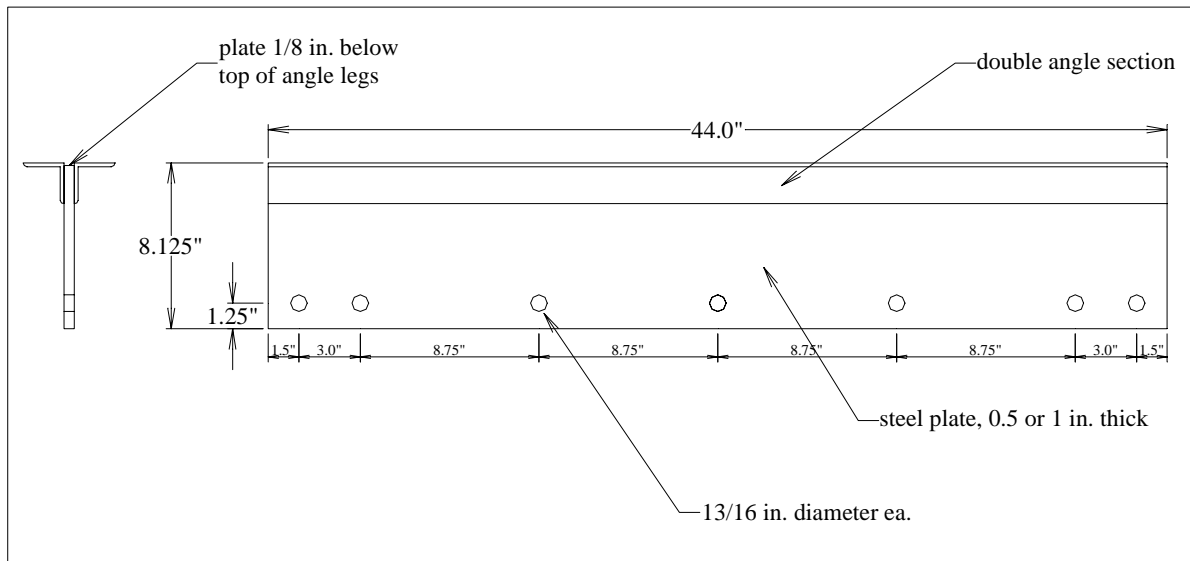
Typical Top Chord Section (Alander et al. 1998)
